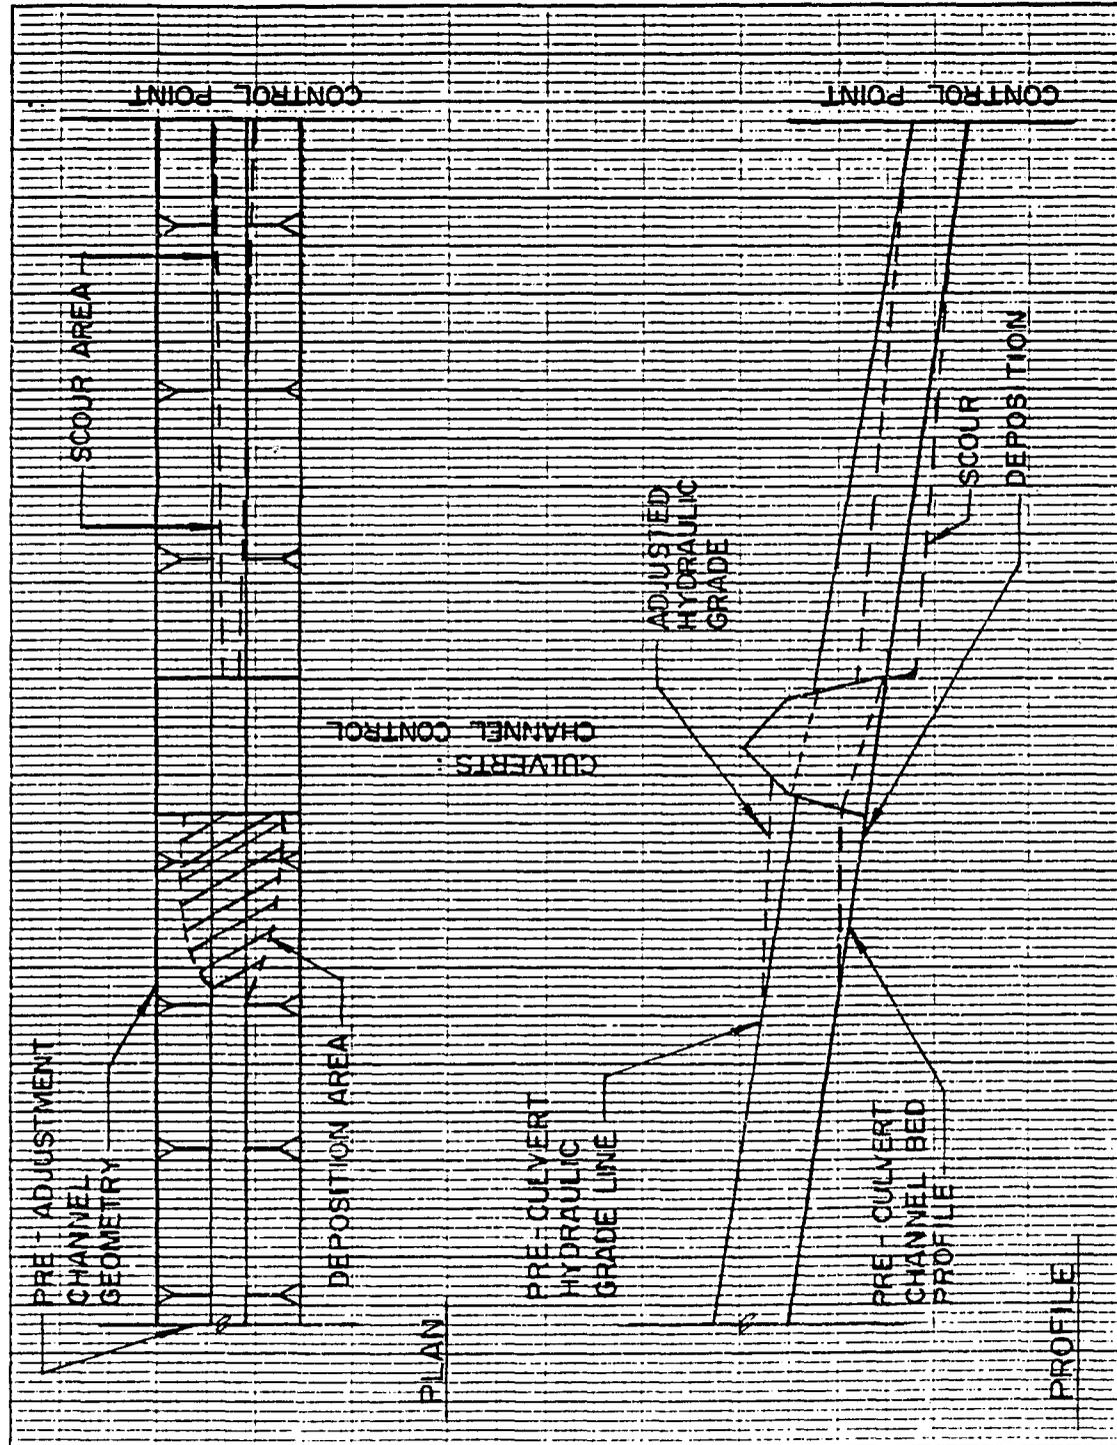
Typical Culvert Adjustment Plan and Profile Views
